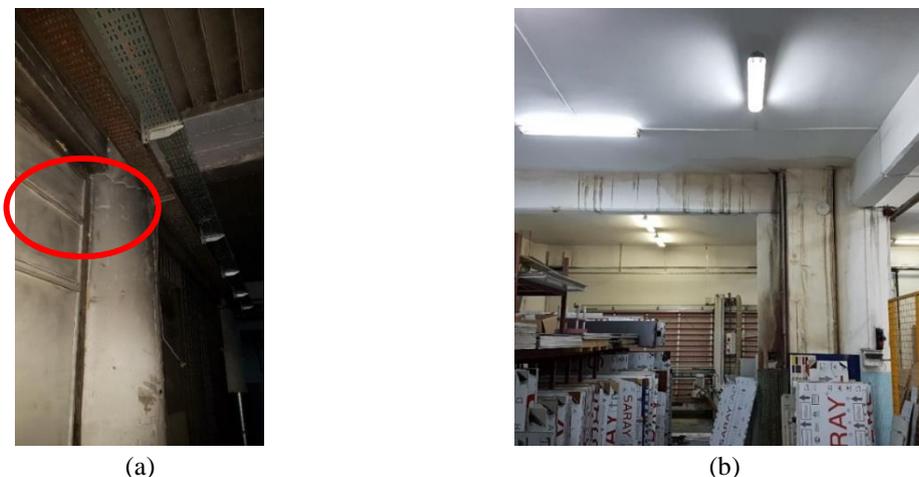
Beam-column connection cracks (a) and the local leakage of the cooling water on 3rd basement (b)
